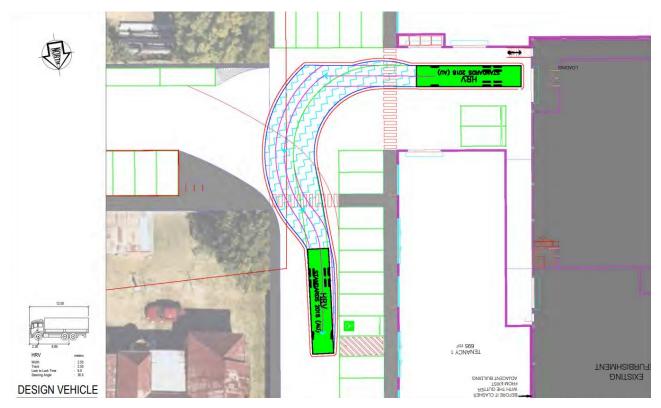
Albert Street Crossover - HRV Loading Zone 2 - Egress Movement
